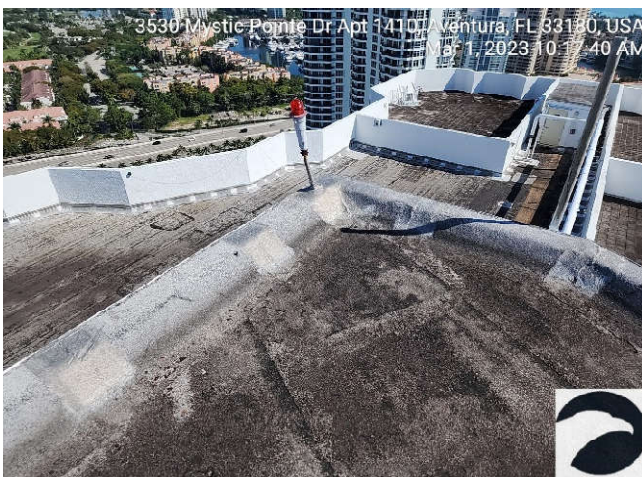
Existing roofing system in poor condition (Upper Roof)
